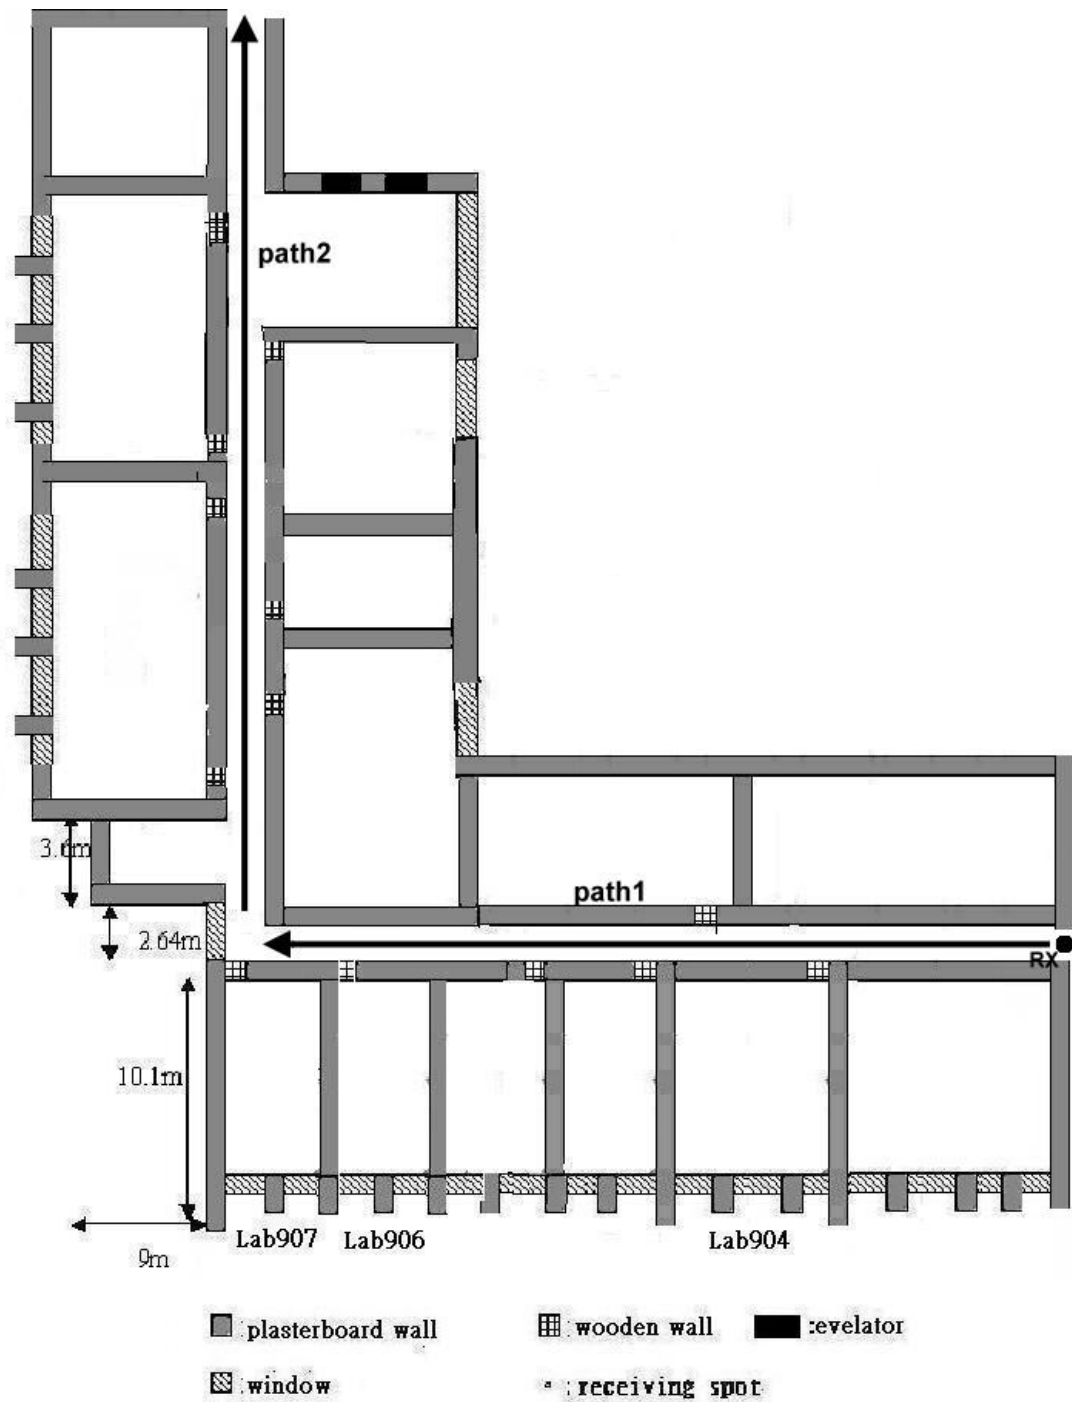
Floor layout of site A located on the second floor of Engineering Building No4
